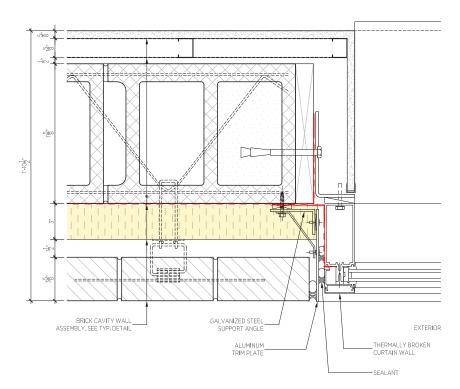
Base case Building - Brick cavity at curtain wall jamb
